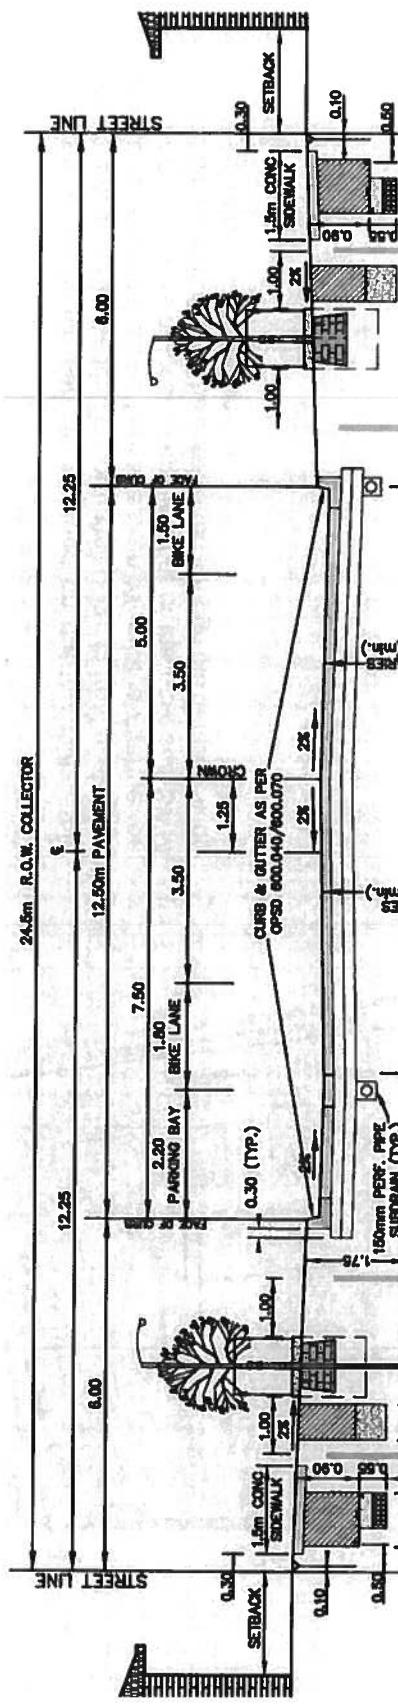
City of Markham Typical Street Cross-Section for 24.5m Collector Road
